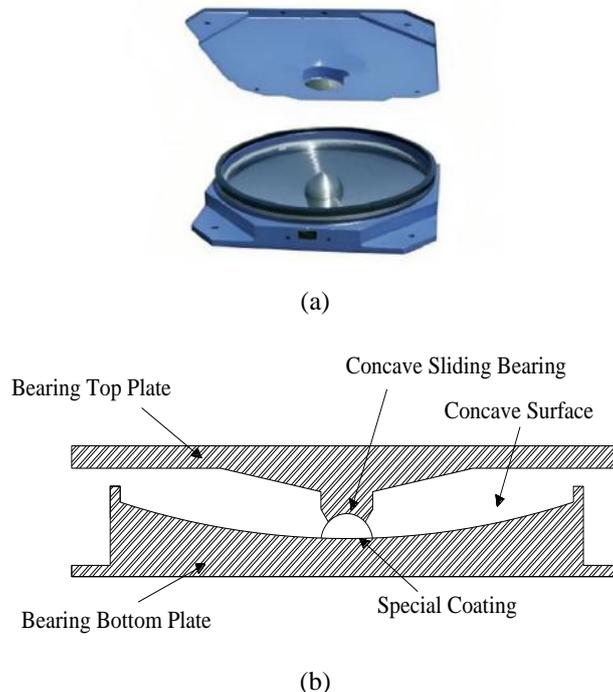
Single friction pendulum bearing (SCFP) (a) three-dimensional view;(b) cross section view.
